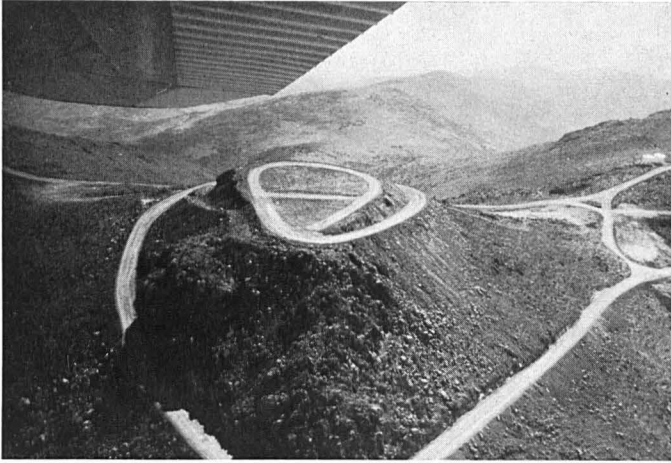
Air view of Main Summit of La Silla from the east with its access road under construction.
